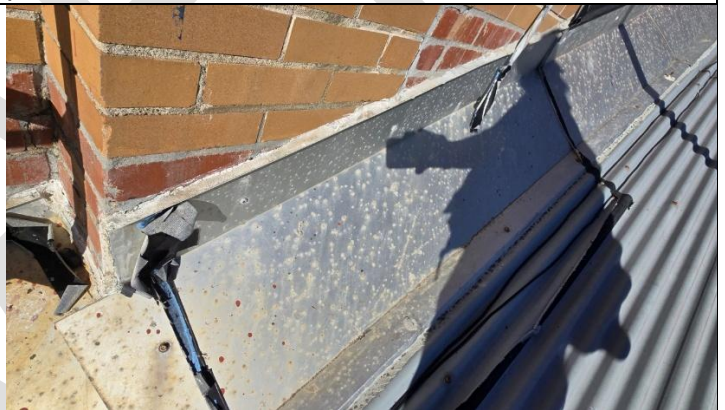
Surface mounted counter flashing between brick parapet and metal roof
